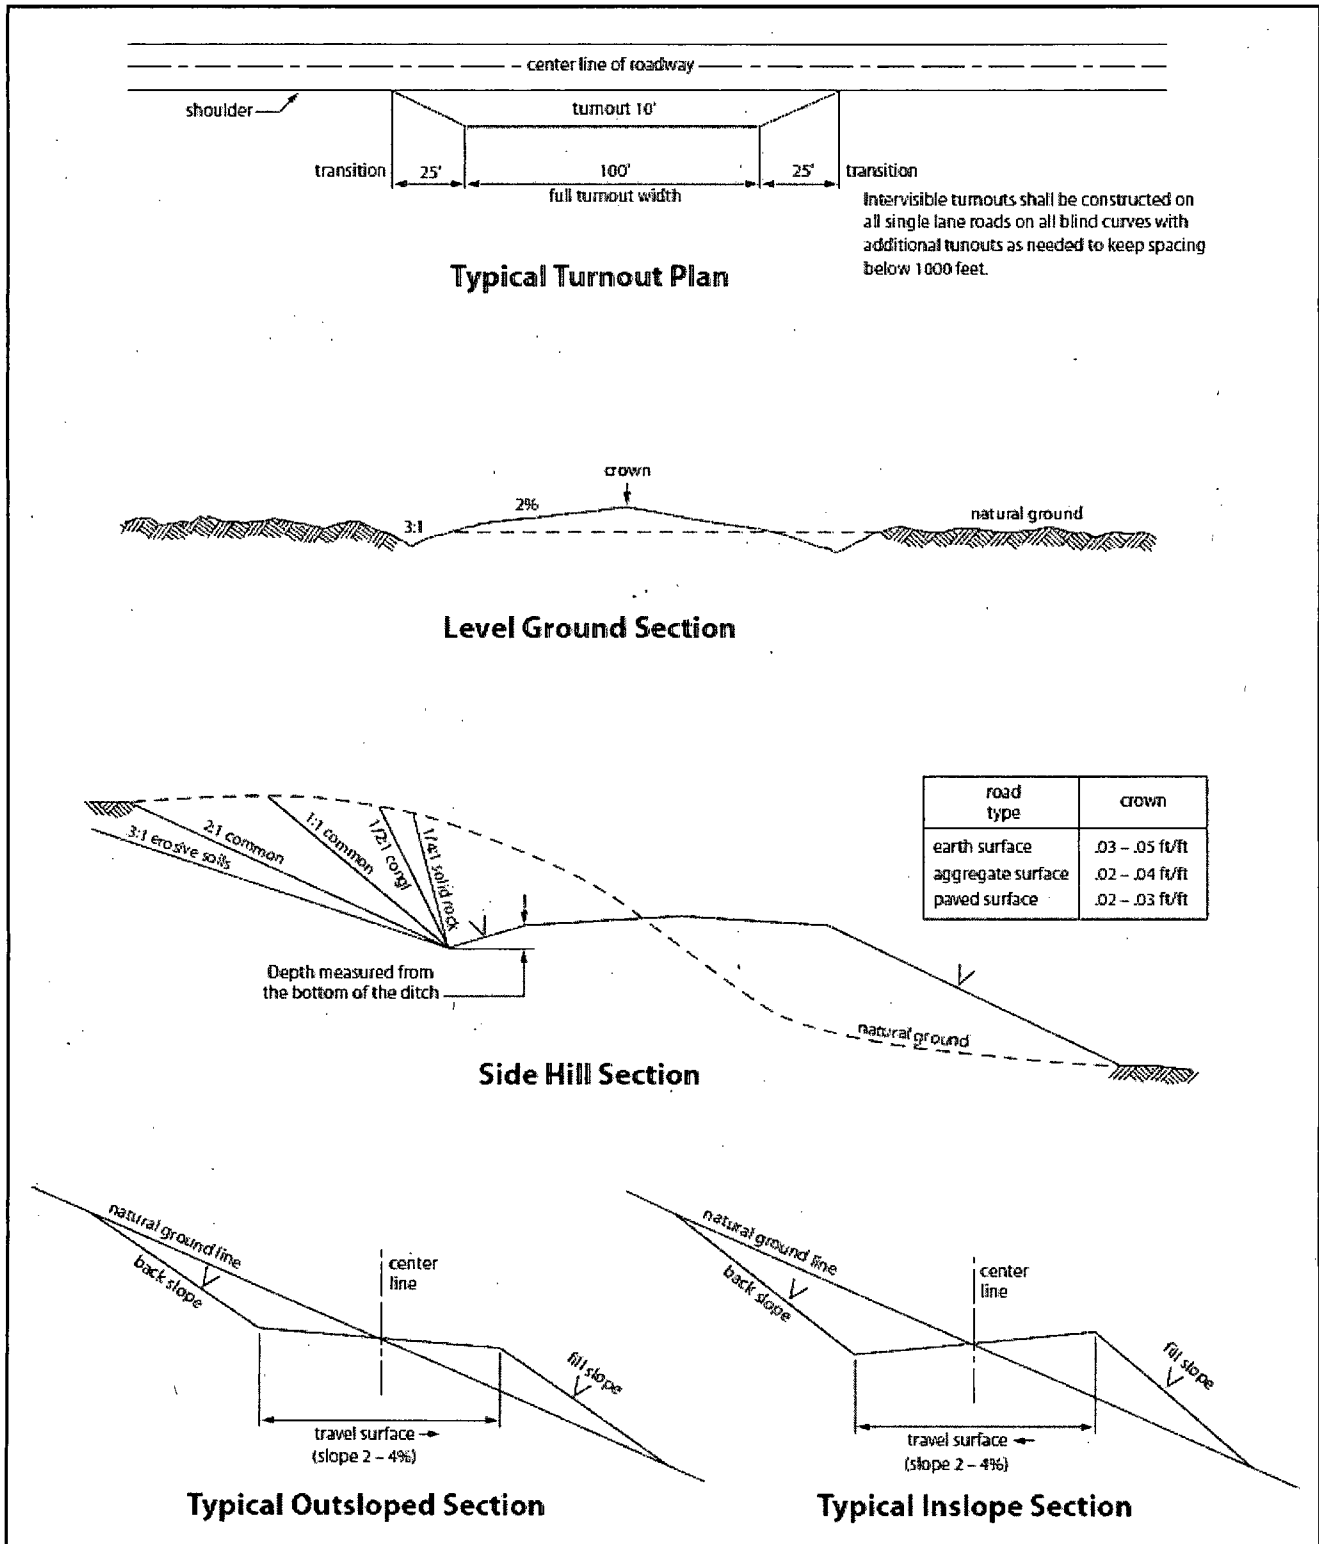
Cross-sections and plans for typical road sections representative of BLM resource or FS local and higher-class roads.
